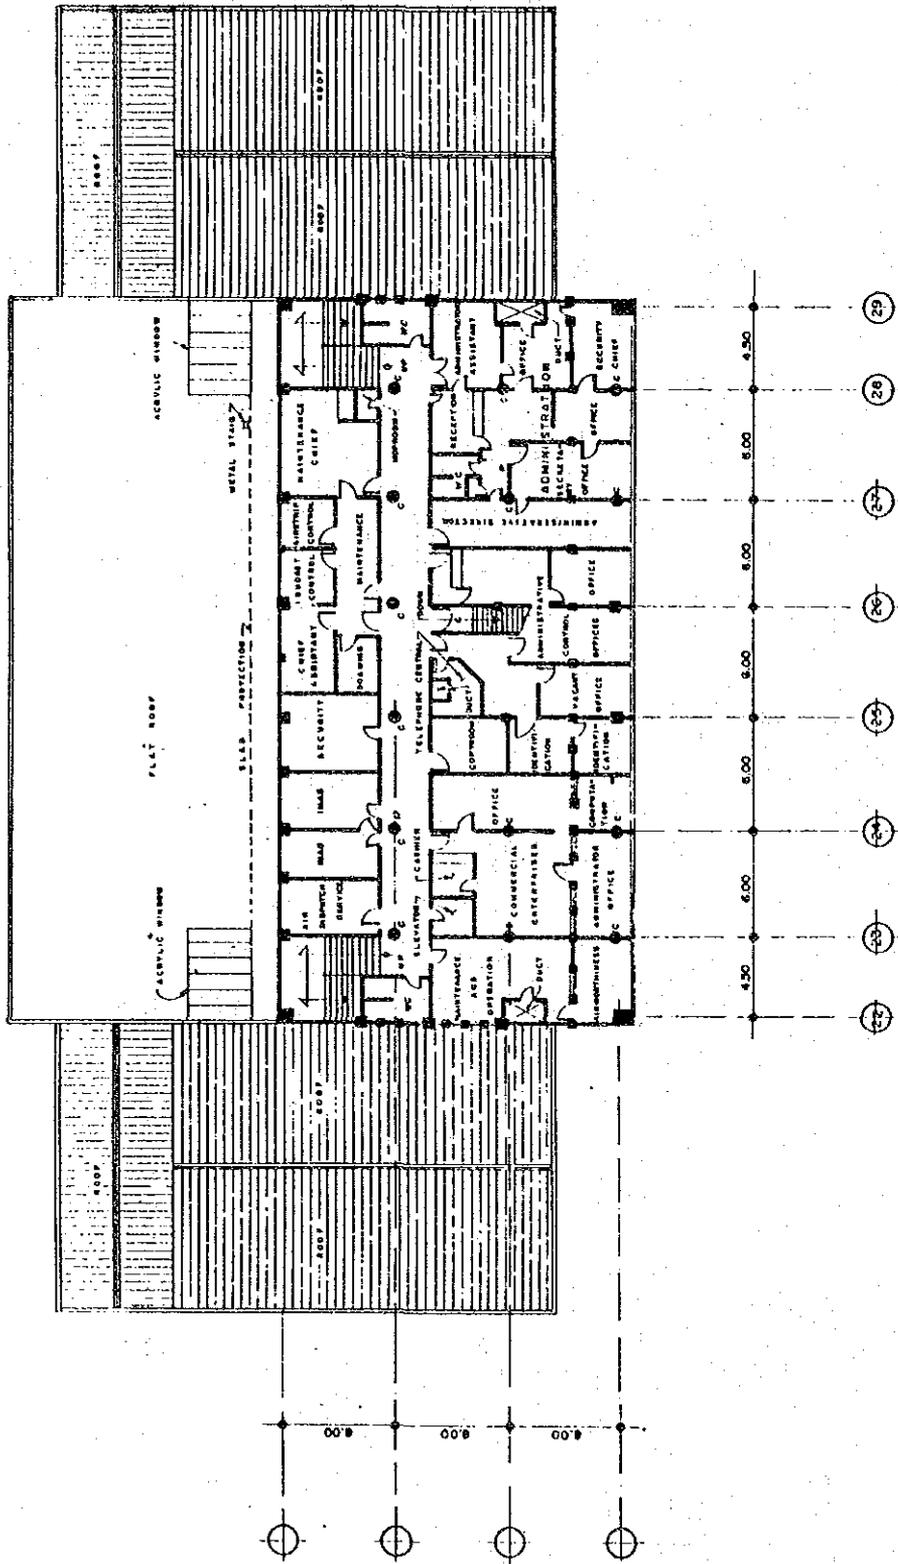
Existing Floor Plan of International Passenger Terminal Building (Second Floor)
